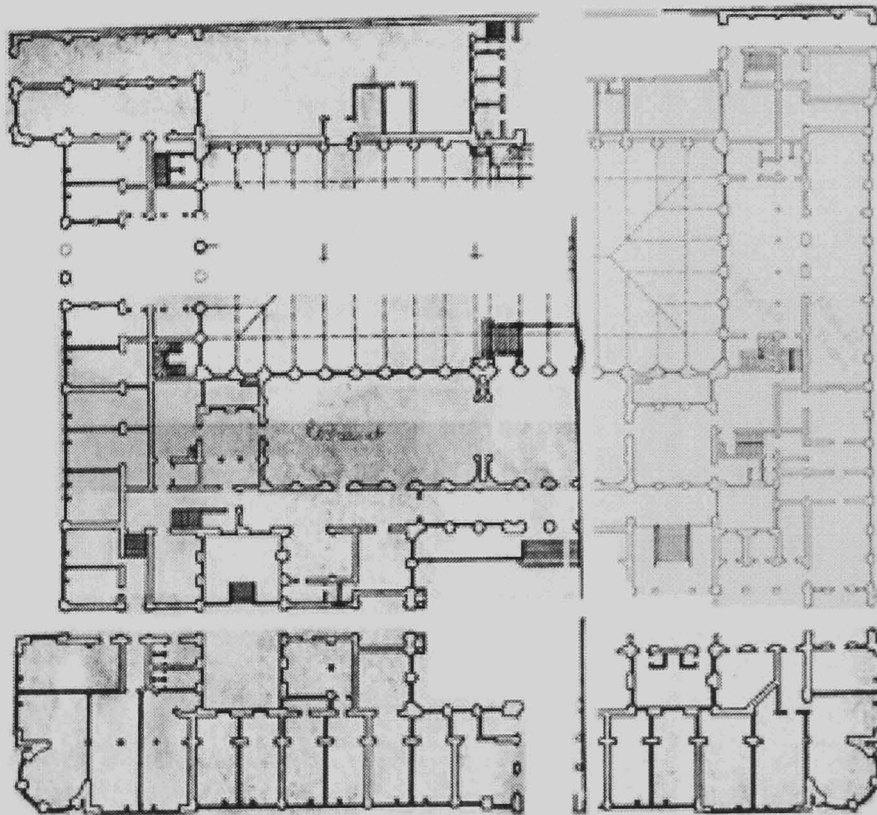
Ground-floor plan of Central Hotel winter garden.
